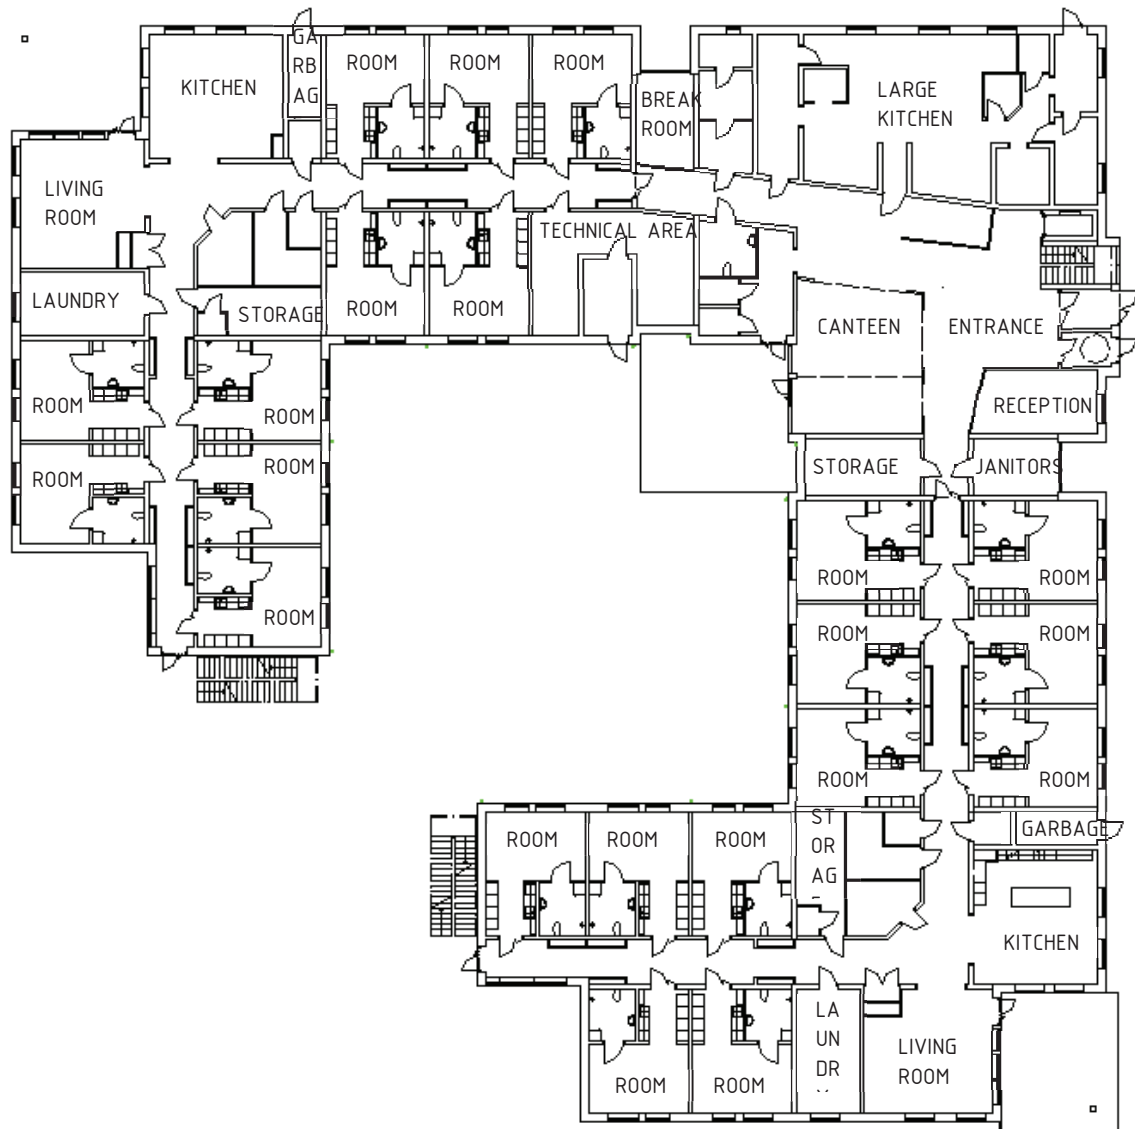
The floor plan of the first floor in the retirement home. The principle with two departments and one central social part is the same on all three floors. (Markgren Arkitektur AB)
